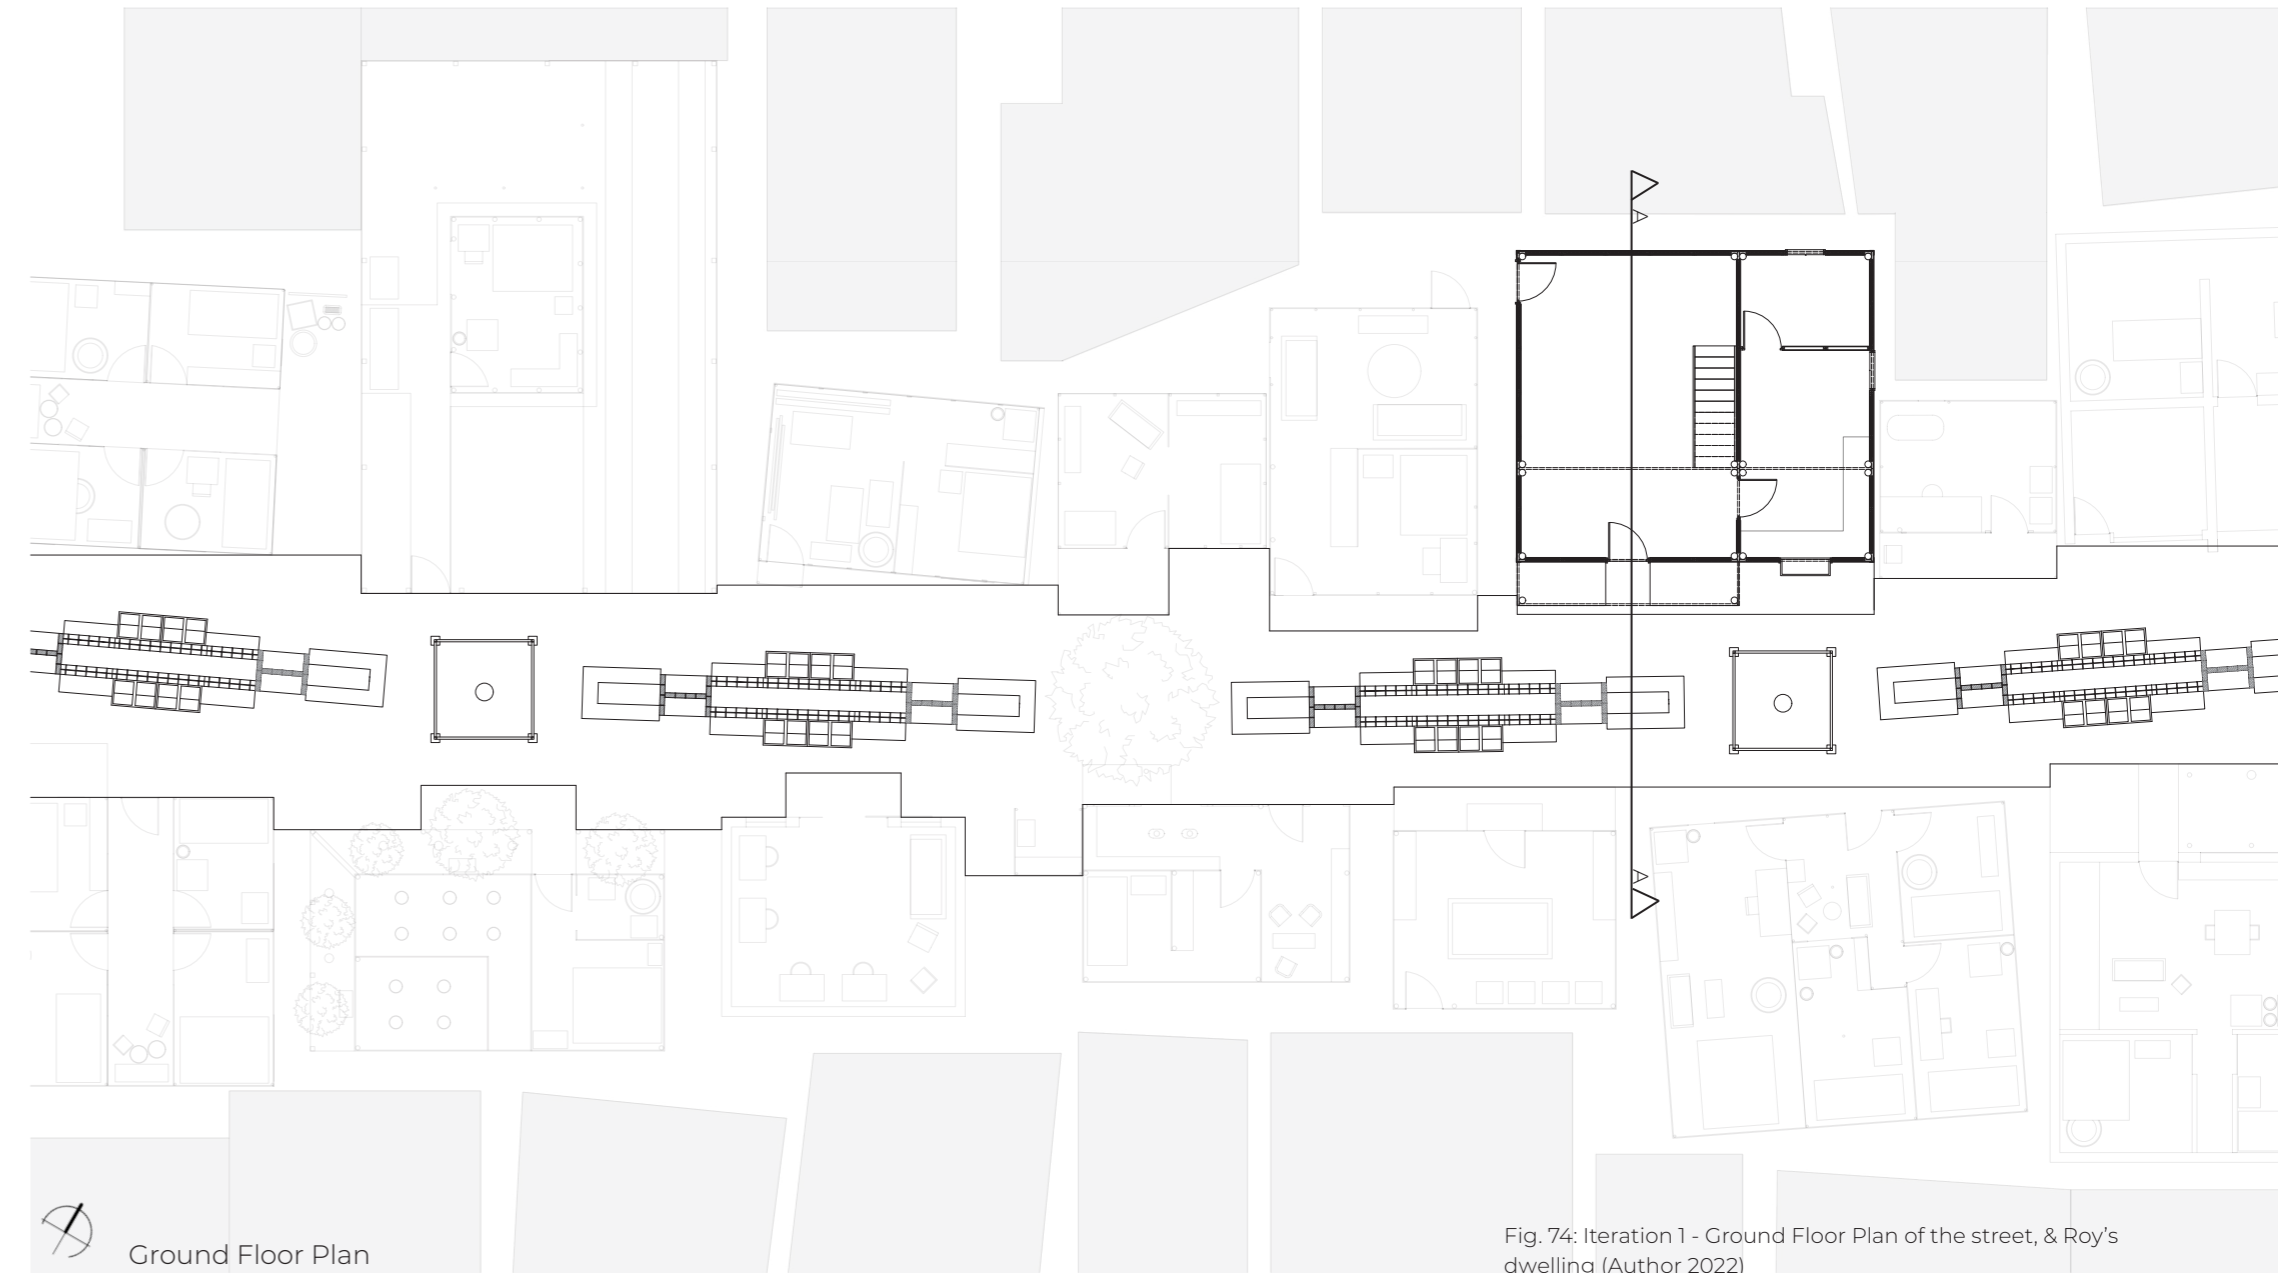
Iteration 1 - Ground Floor Plan of the street, & Roy's dwelling (Author 2022)
